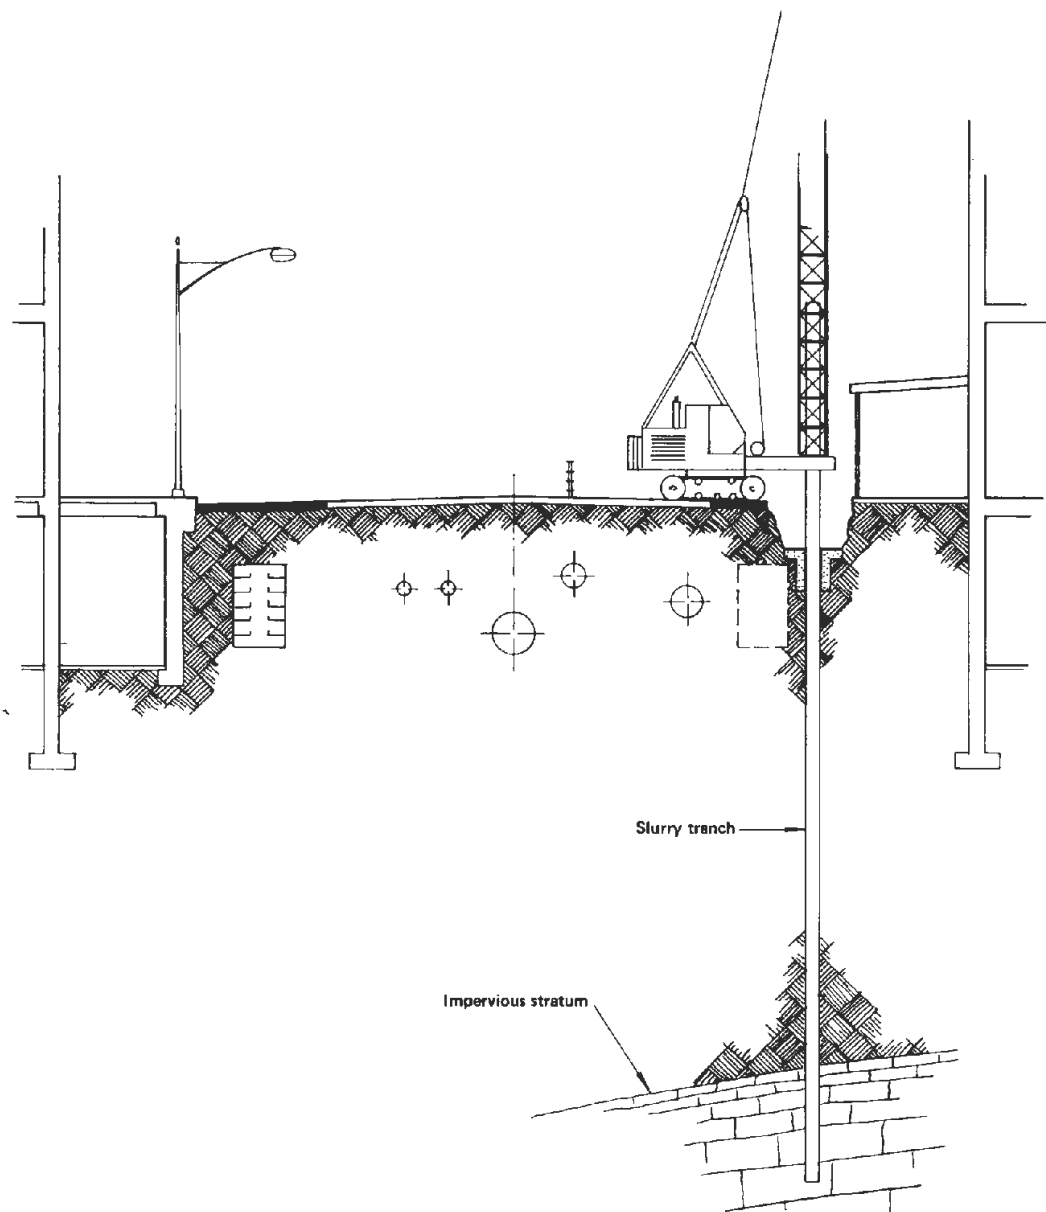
Step 6: Dig slurry wall and install prefabricated vertical elements.
